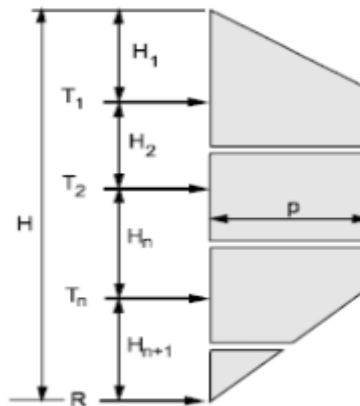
Calculation of Anchor Loads for Multi - Level anchored Wall
